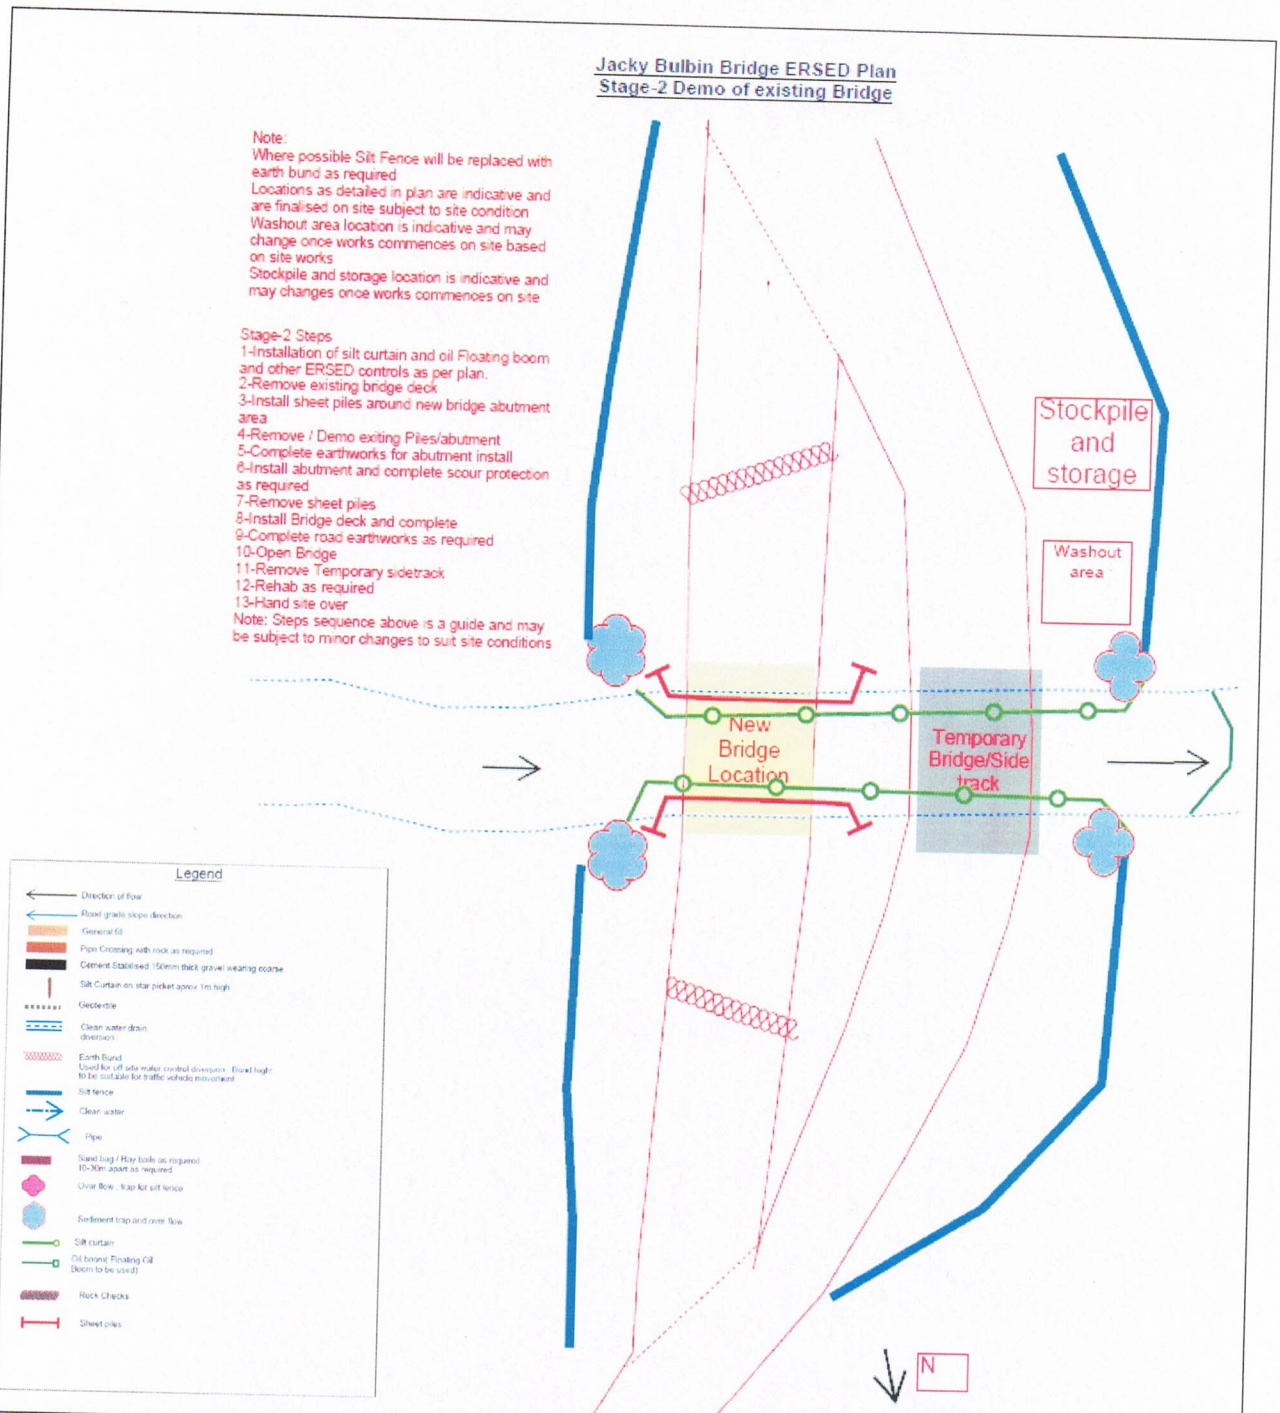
Site layout plan for Jackybulbin Bridge works (demolition of old and construction of new bridge) including minimum sediment and erosion control actions as described within the Permit Activity section above.
